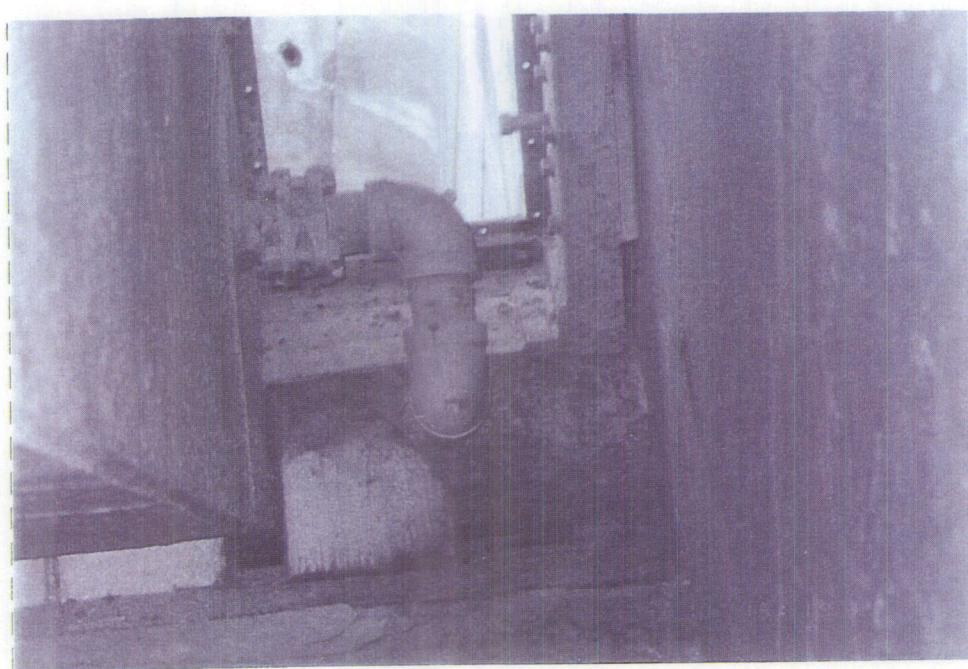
Morris Dam - 70' x 18' Drum Gate #2 - D/S side of chamber, looking upwards through hatch to spillway. Ejector piping leading to right trunnion.. - (9/10/98).
